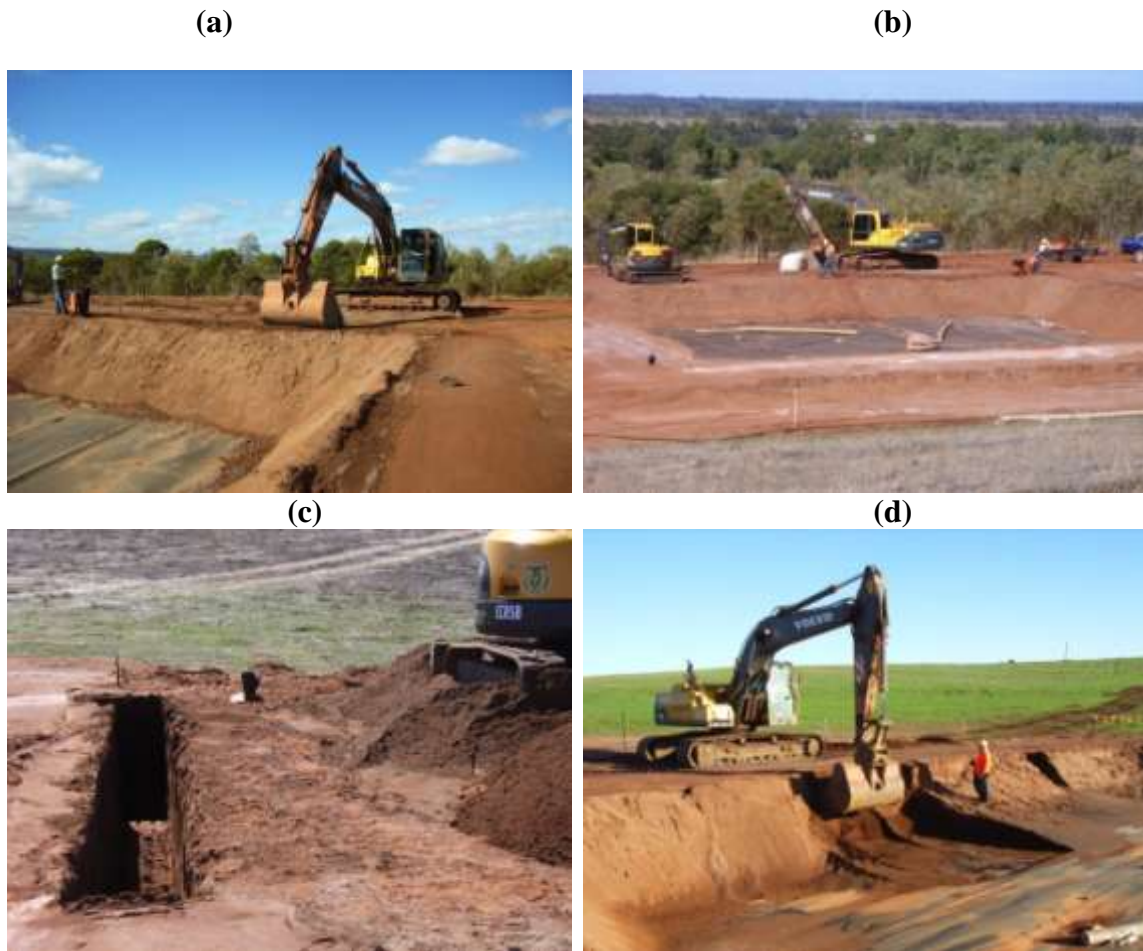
(a) Commencing construction of 2nd lift, (b) each side of the lysimeter has been completed, (c) a trench is cut along the lysimeter perimeter and the excavated sand mixed with cement, replaced and compacted, and (d) after sand/cement mix has hardened, the sand on the internal side of the lysimeter wall is excavated to produce four vertical walls
